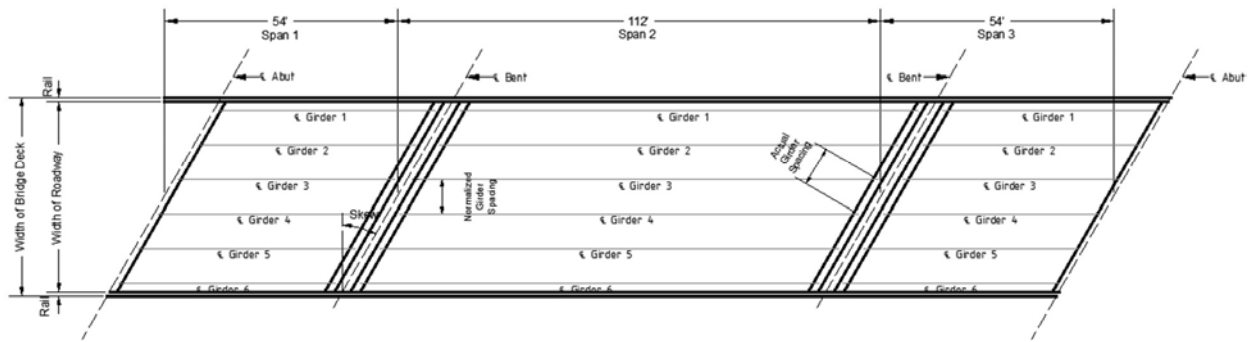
Top View of the 45 Degrees Skewed ITBC with Spans and Girders
